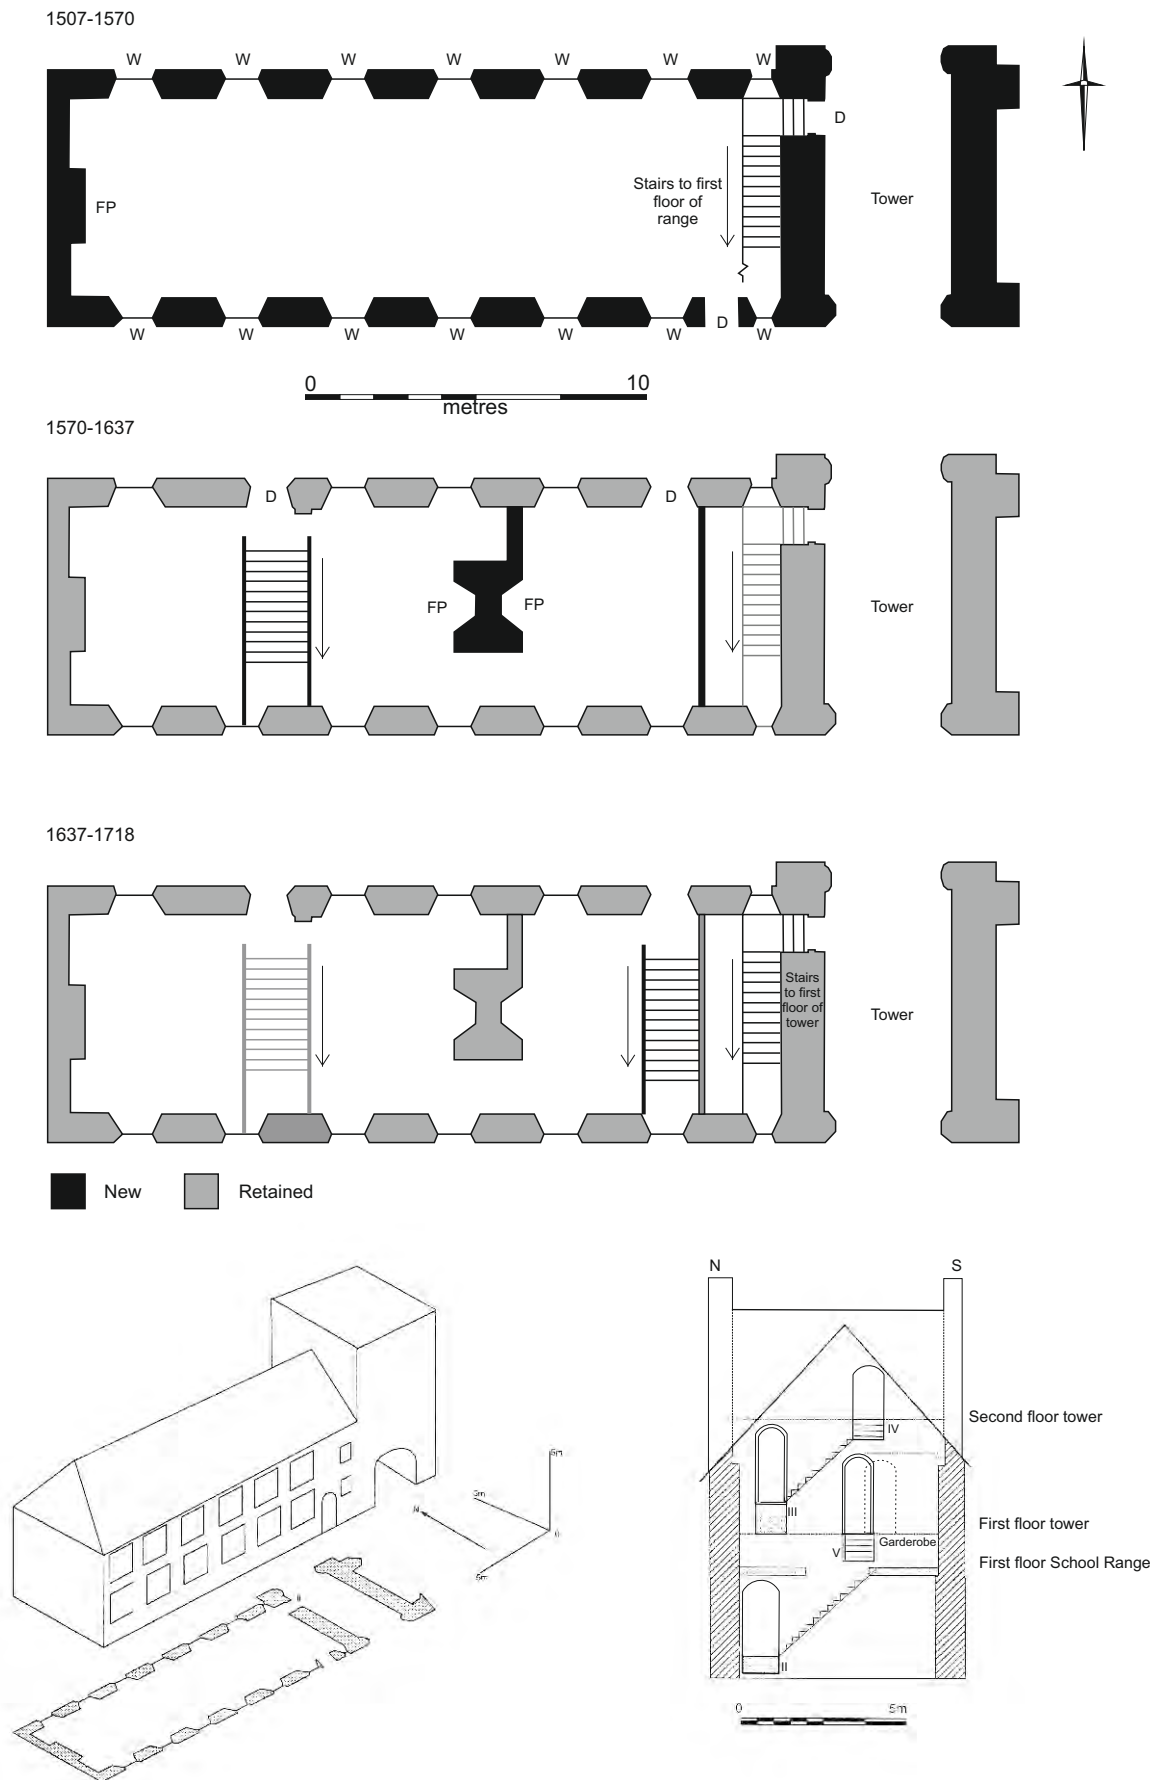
Reconstruction of 16th - 18th century ground floor layouts and elevation within the School Range and Gatehouse
